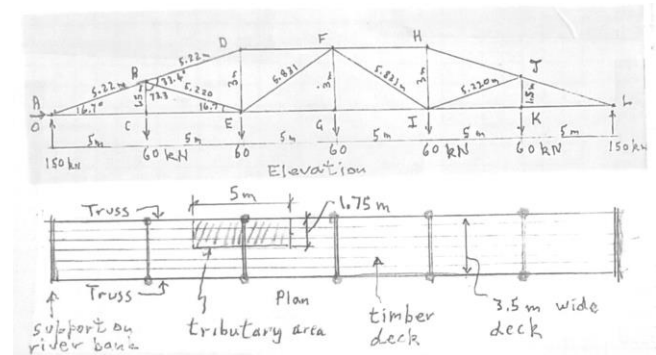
Summary of truss analysis for Palladio's truss bridge over the Cismone River
